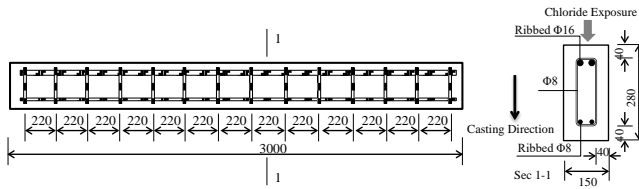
Reinforcement layout of type A beams. Dimensions are in mm
